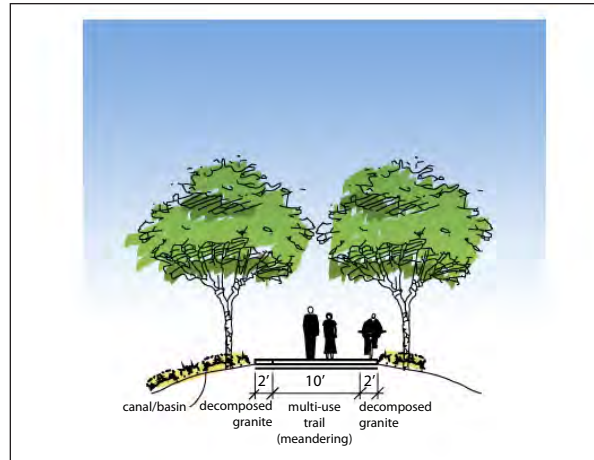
Cross section for multi-use trail next to canal or basin
